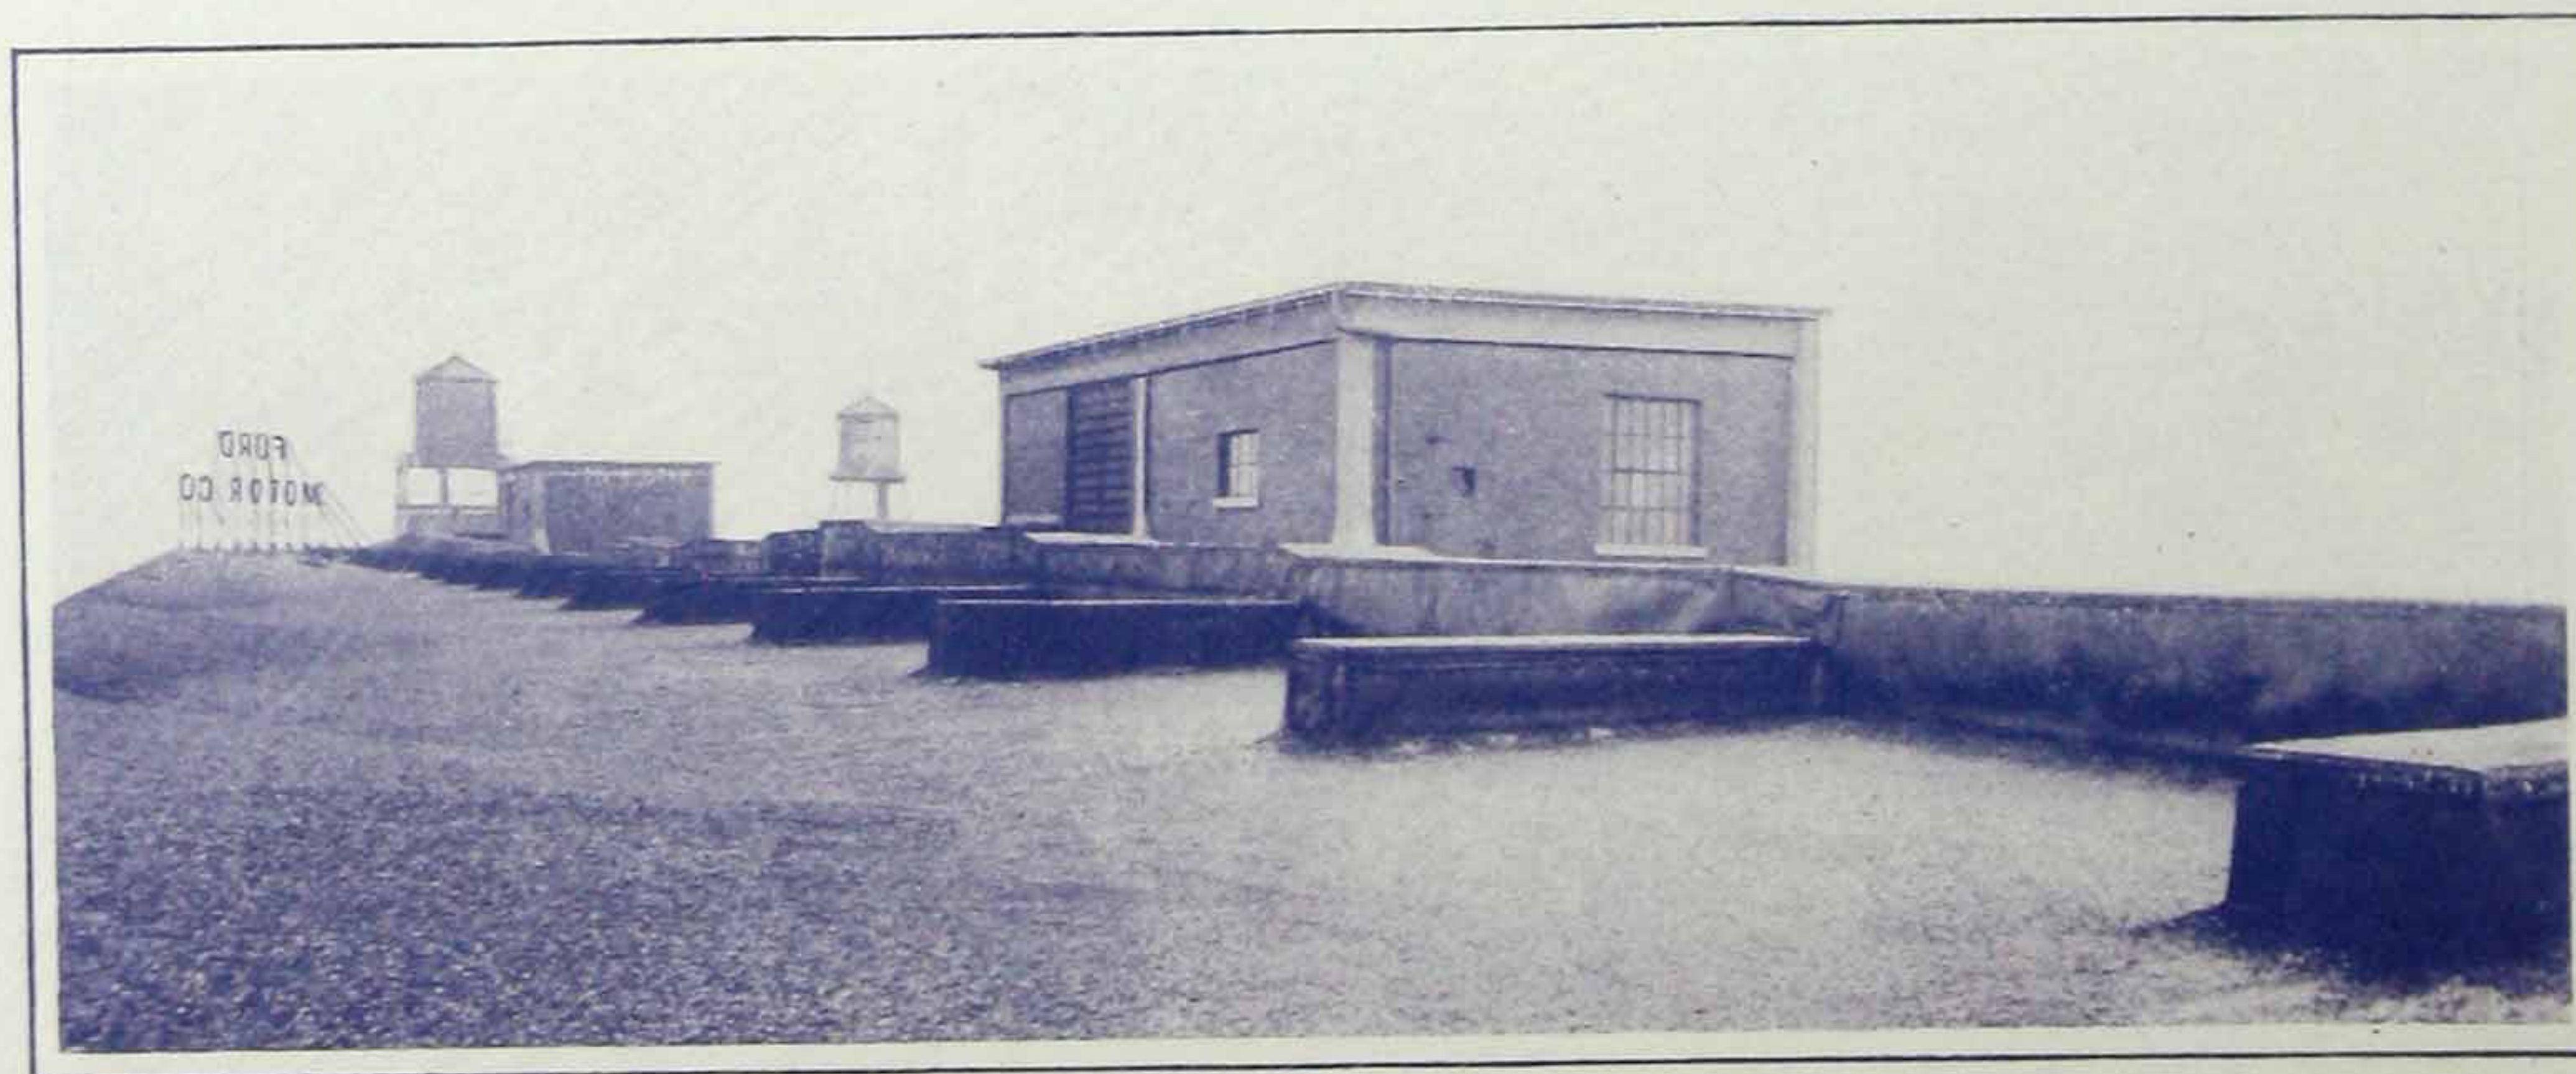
Pent houses on roof of Ford Canadian Plant. This illustration helps show adaptability of this Sirocco plan, with its many blade fan, to the small as well as large plants.
